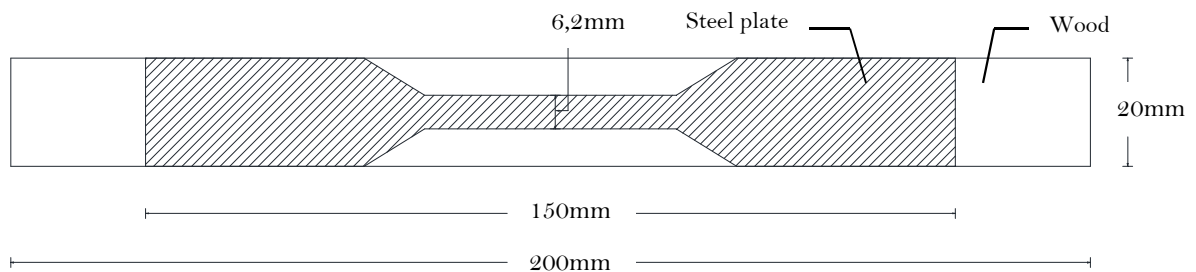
Bottom view of a steel plate reinforced wood beam
